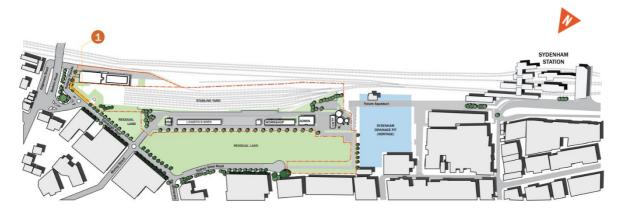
Proposed plan of Marrickville Dive Site and SMTFS (Hassell)
